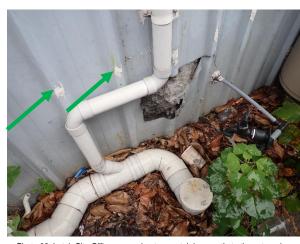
Lot 4, Site Office, non-asbestos containing mastic to the external metal walls
